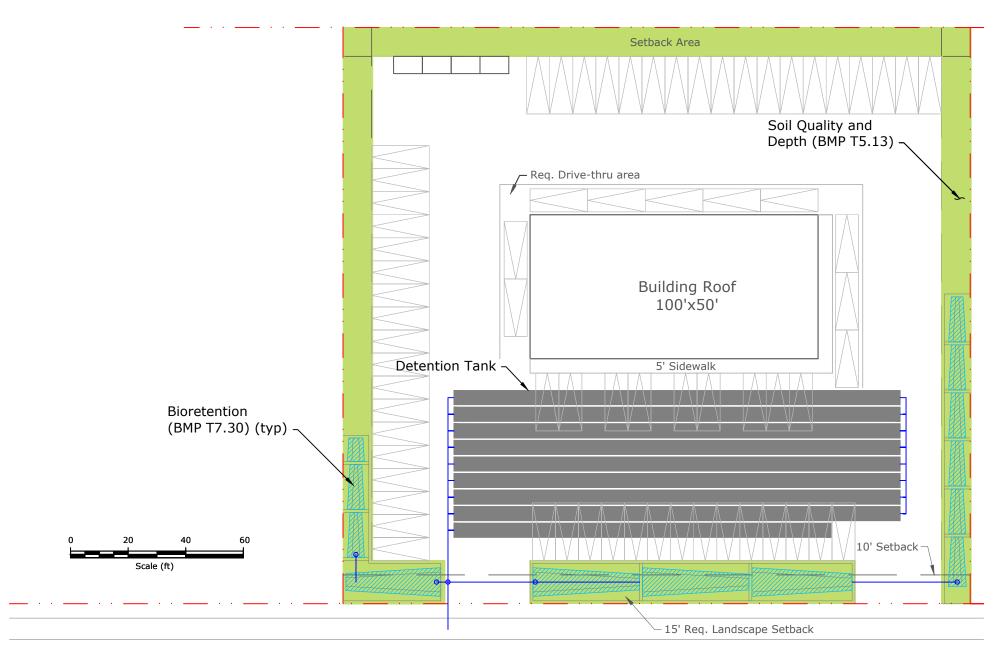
Scenario 10. Permanent Stormwater Site Plan – Small Commercial Development, 2012 Requirements, Till Soils
